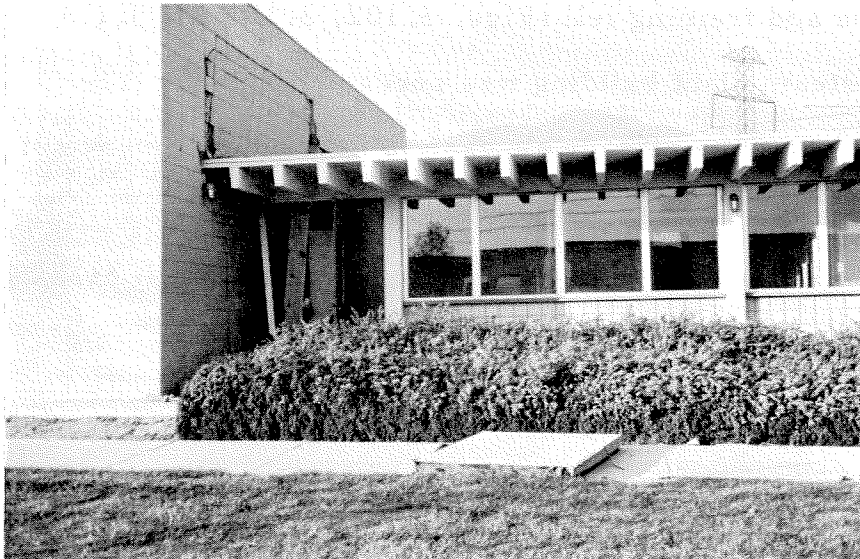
Damage to concrete block wall caused by pounding of adjacent roof. San Fernando Juvenile Facility.
